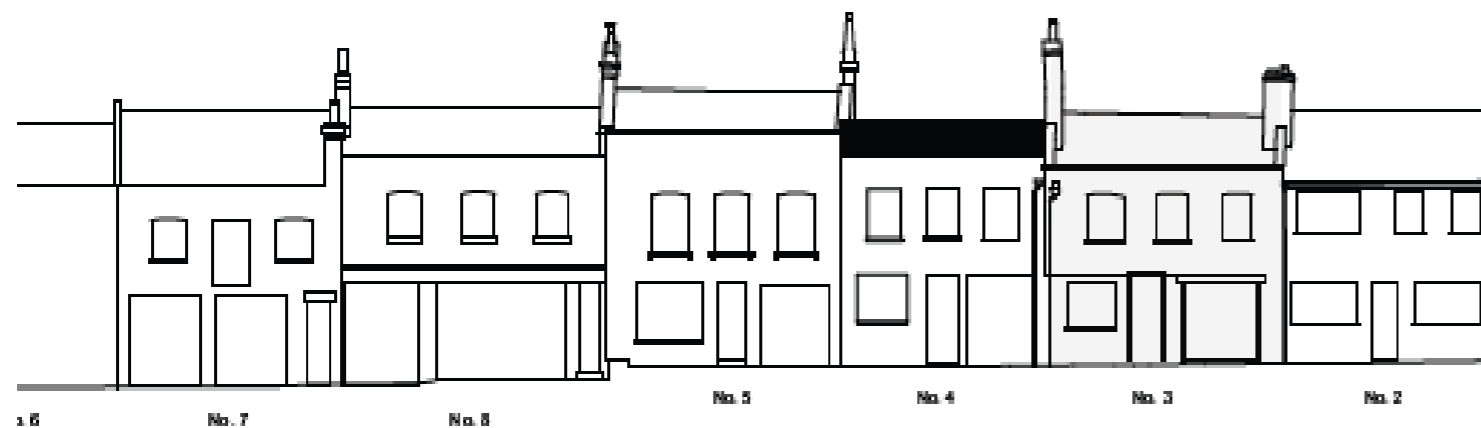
Existing roof profiles in elevation along Dunstable and Clarkes Mews
